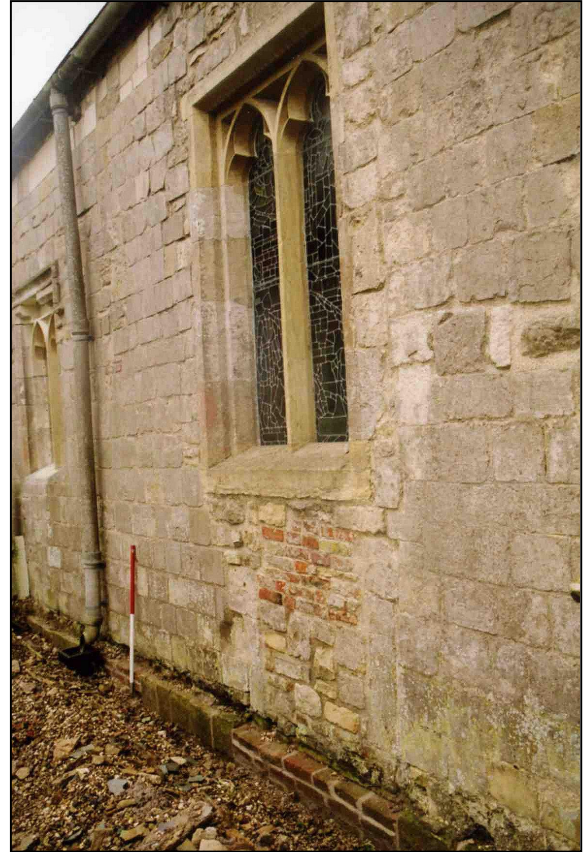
West end of north aisle, showing blocked opening beneath window, looking SE.
